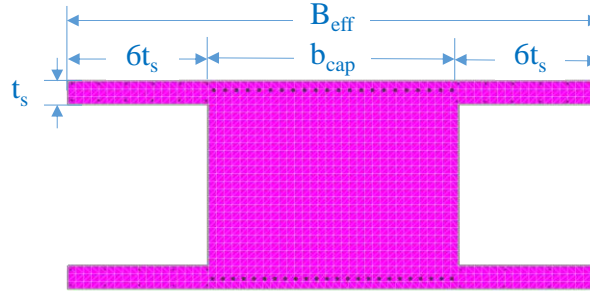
(a) Typical XTRACT [17] bent cap flanged cross-section for the full-scale prototype bridge when 12ts effective width is considered and slab transverse reinforcement is included;
